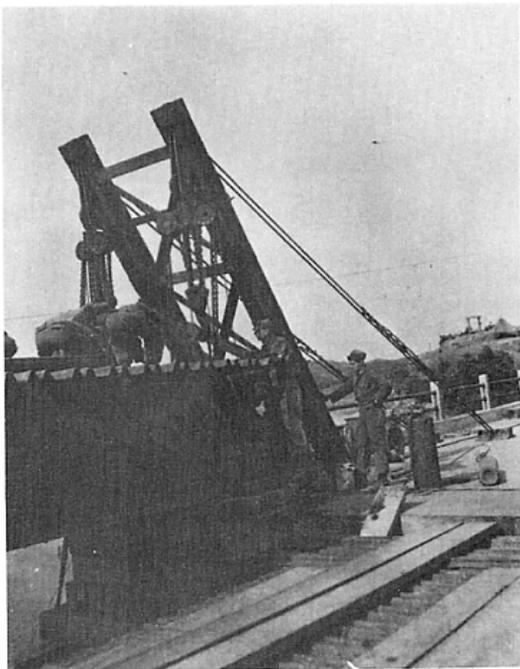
Troops setting up the pumpcrete pipe to pour concrete decking.
